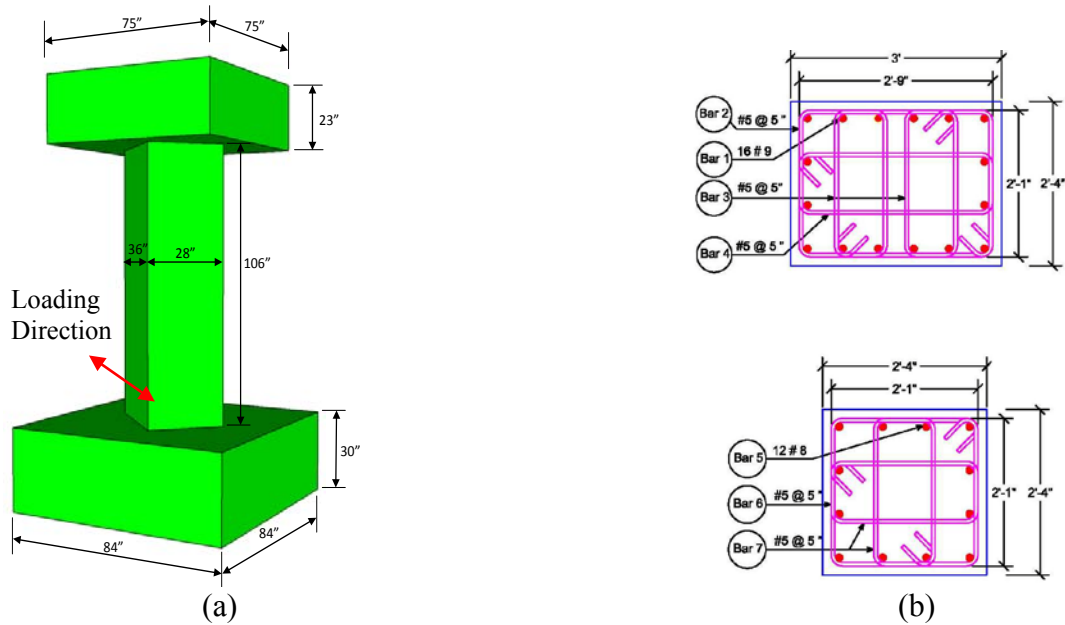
Column specimen assembly and detailing: (a) 3D rendering of PF specimens, (b) cross-sectional detailing of PF (top) and SF specimens (bottom).
